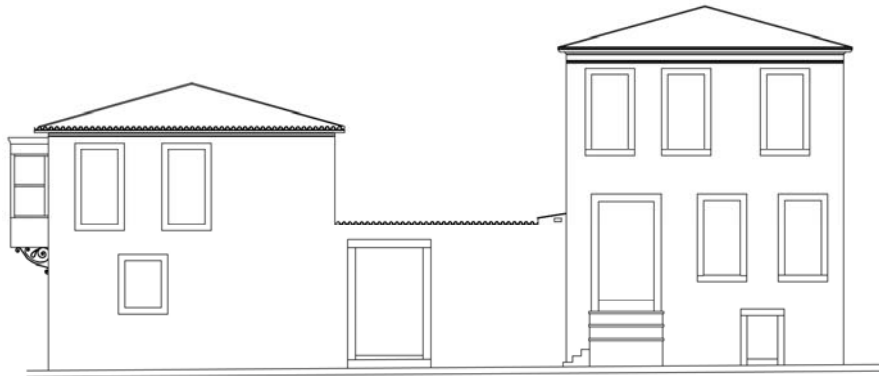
Silhouettes that should be conserved at 404 Street
